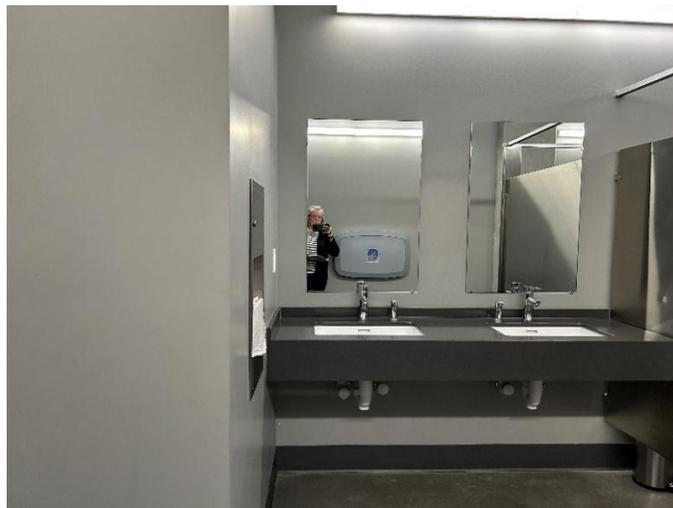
Karuna II West Street level gendered toilet room finishes.
